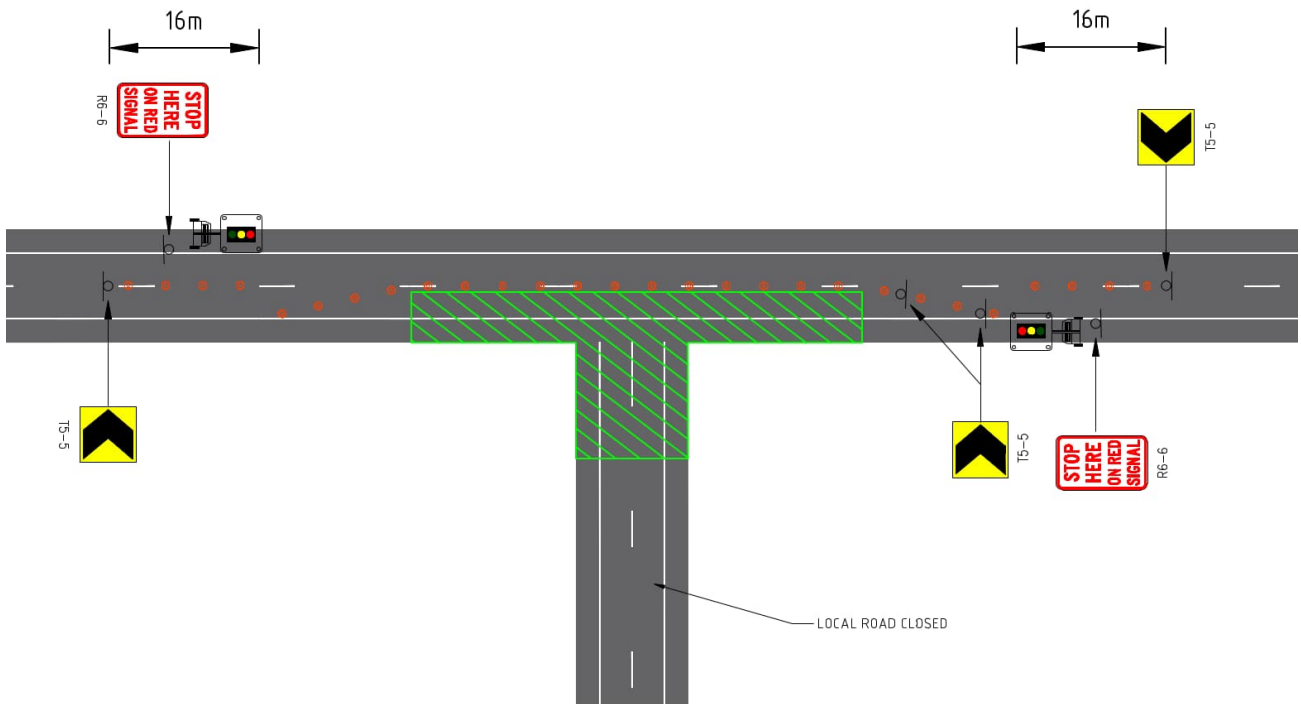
ARRANGEMENT FOR CONSTRUCTION OF INTERSECTION UPGRADES
